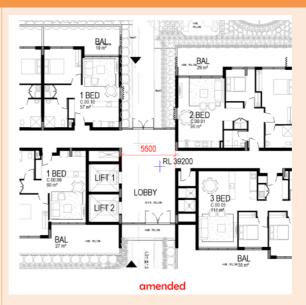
(repeated): Amended DA width of the lift lobby / foyer in Building C is now proposed to be widened to 5.5m wide.
